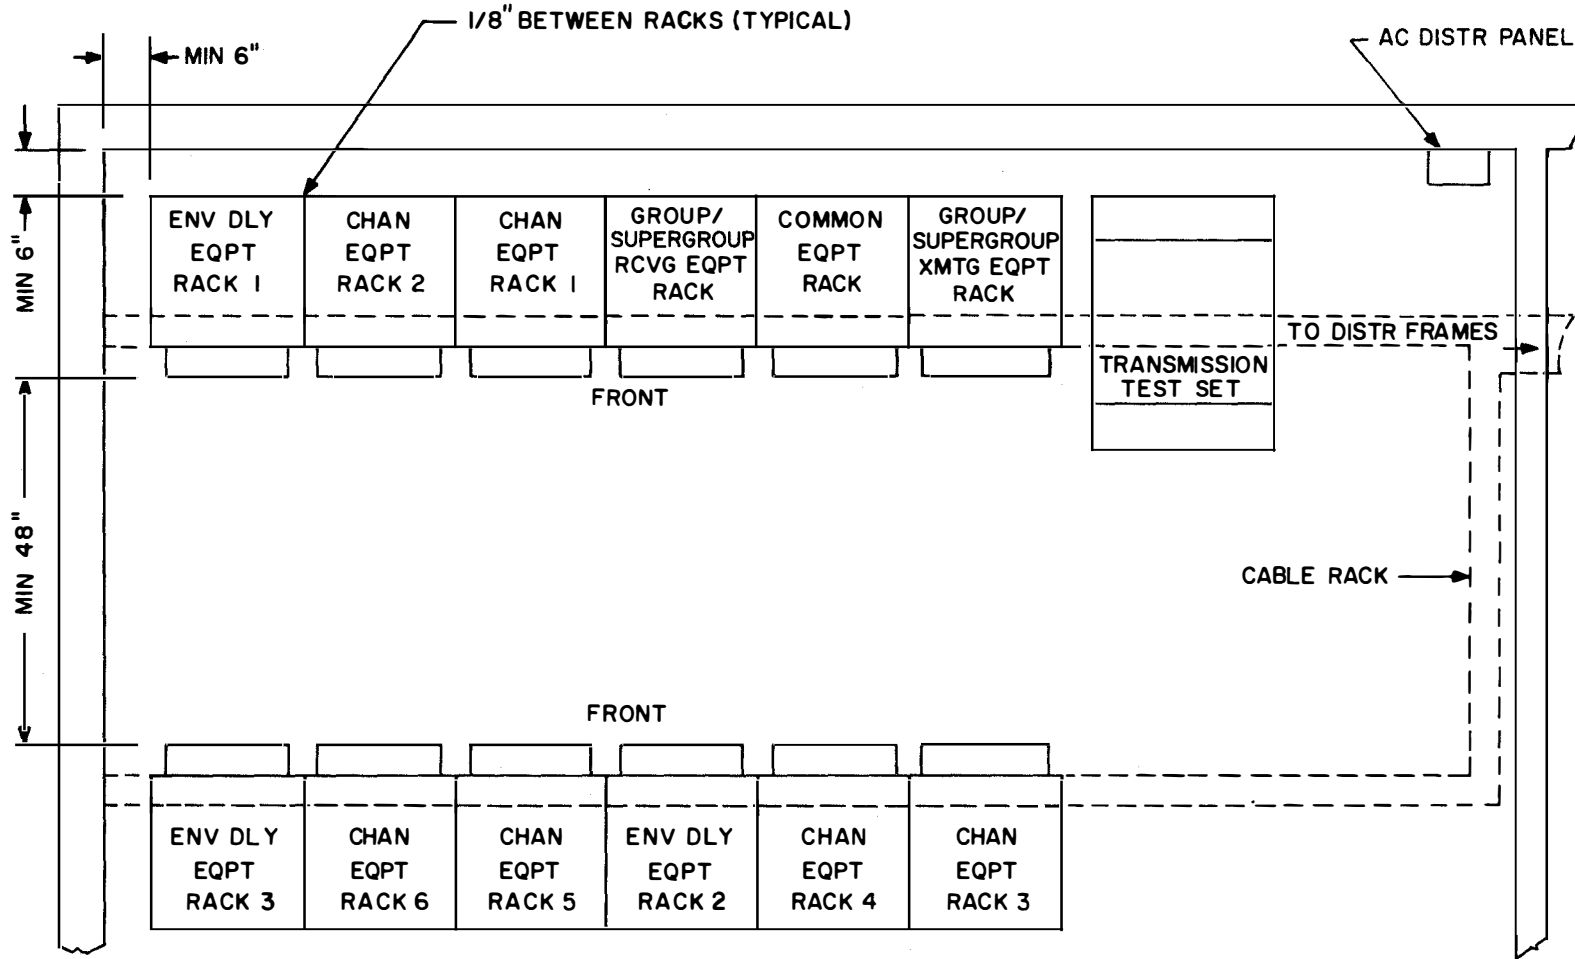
AN/UCC-4(V) Typical Floor Plan
